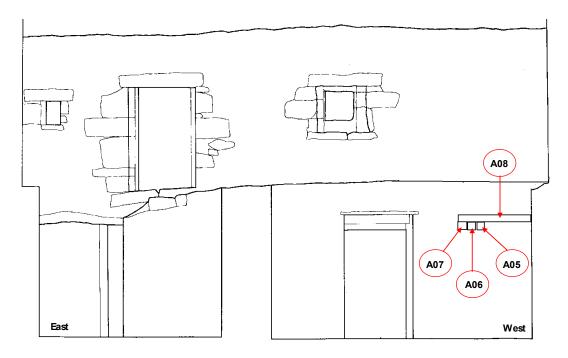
Drawing of south wall interior to show sample locations (after Plowman Craven & Associates, architects)
